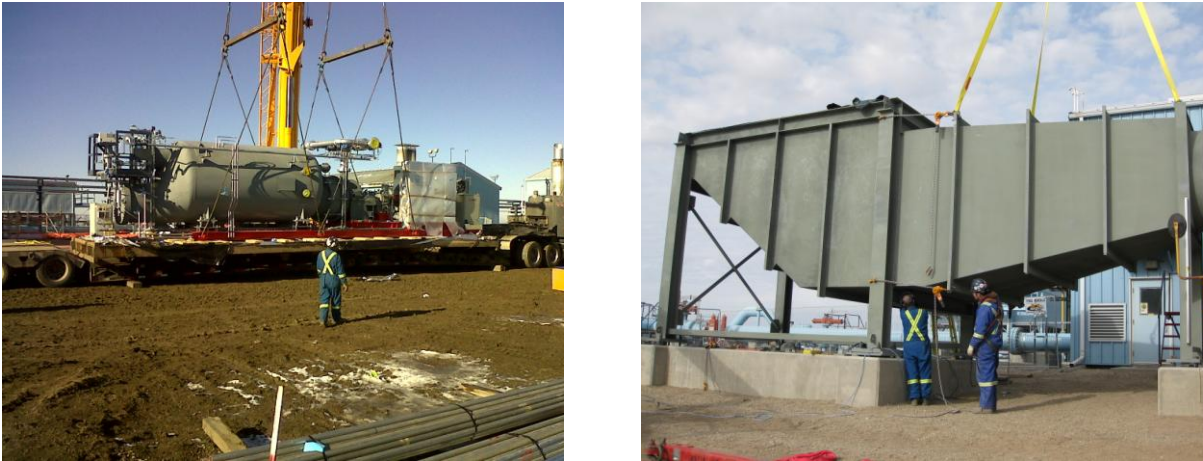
The ORC skid and Waste Heat Oil Heater Inlet Plenum are positioned by crane.
